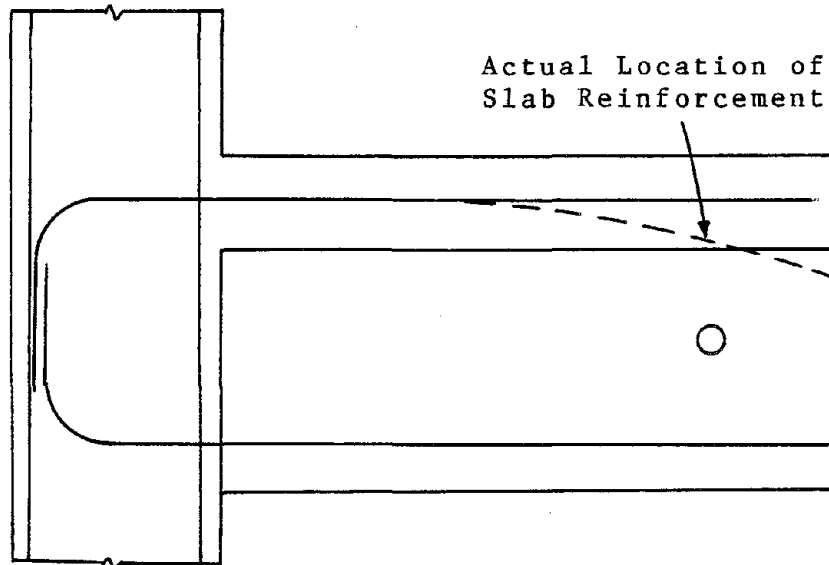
Actual Location of Slab Longitudinal Reinforcement in Specimen 8.
